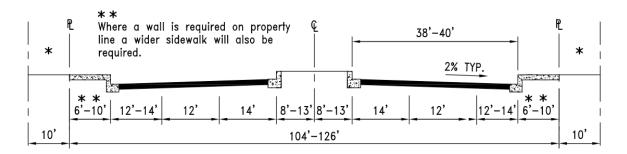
Existing Typical Section for Primary Arterial (Commercial Street)
